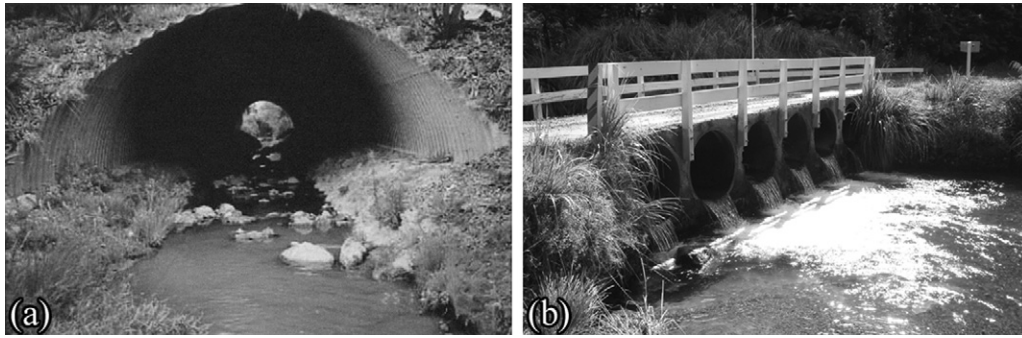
(a) Ideal culvert design (from Boubée et al., 1999); (b) example of an impassable culvert caused by an overhung outlet.
